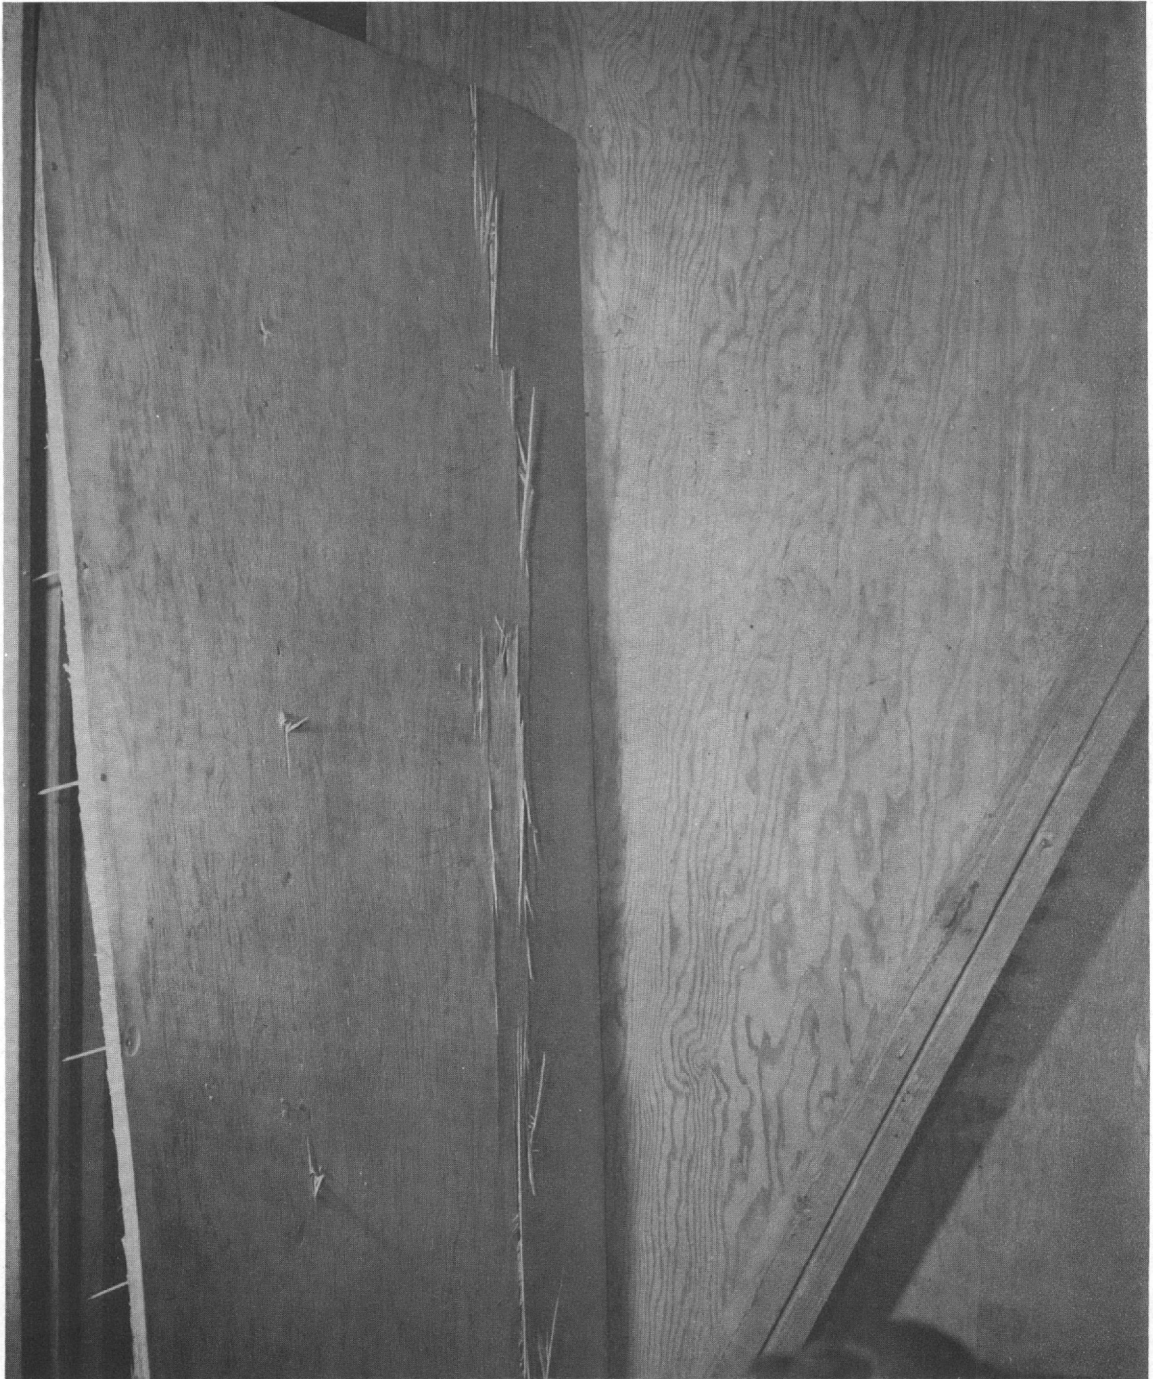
Damage to wall between entrance tunnel and generator room after shot Diablo.
